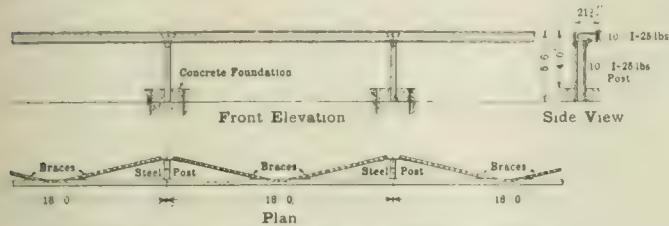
CONSTRUCTION OF MONORAIL SYSTEM.
